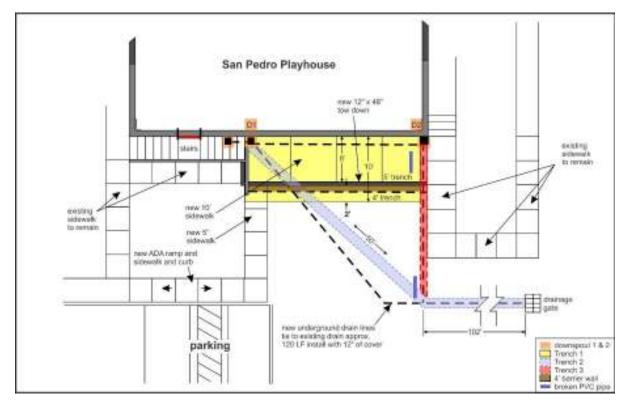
Schematic plan of the planned drainage improvements adjacent to the San Pedro Playhouse.
